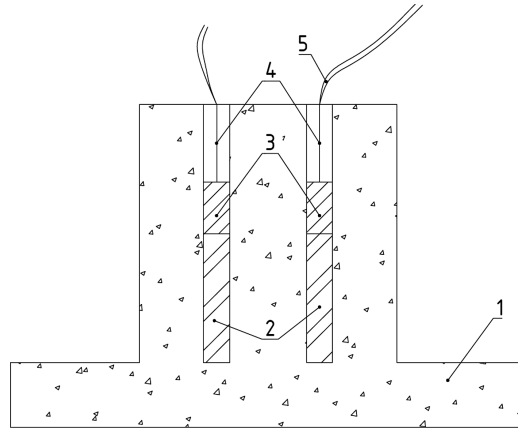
Blasthole charges layout while foundation grinding: 1 – foundation; 2 – blasting charge; 3 – electric detonator; 4 – stemming; 5 – wires.
